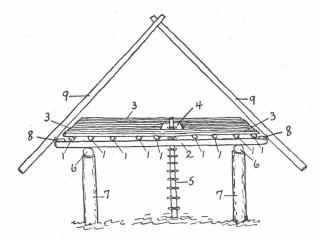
House platform (whata), or upper story: 1, longitudinal joists (tarewa); 2, crossbeams (vae); 3, cross pieces forming floor (papa); 4, opening (ngutu whata, door of platform); 5, ladder (ara); 6, longitudinal beams (hapai); 7, posts; 8, wall plates; 9, principal rafters.
